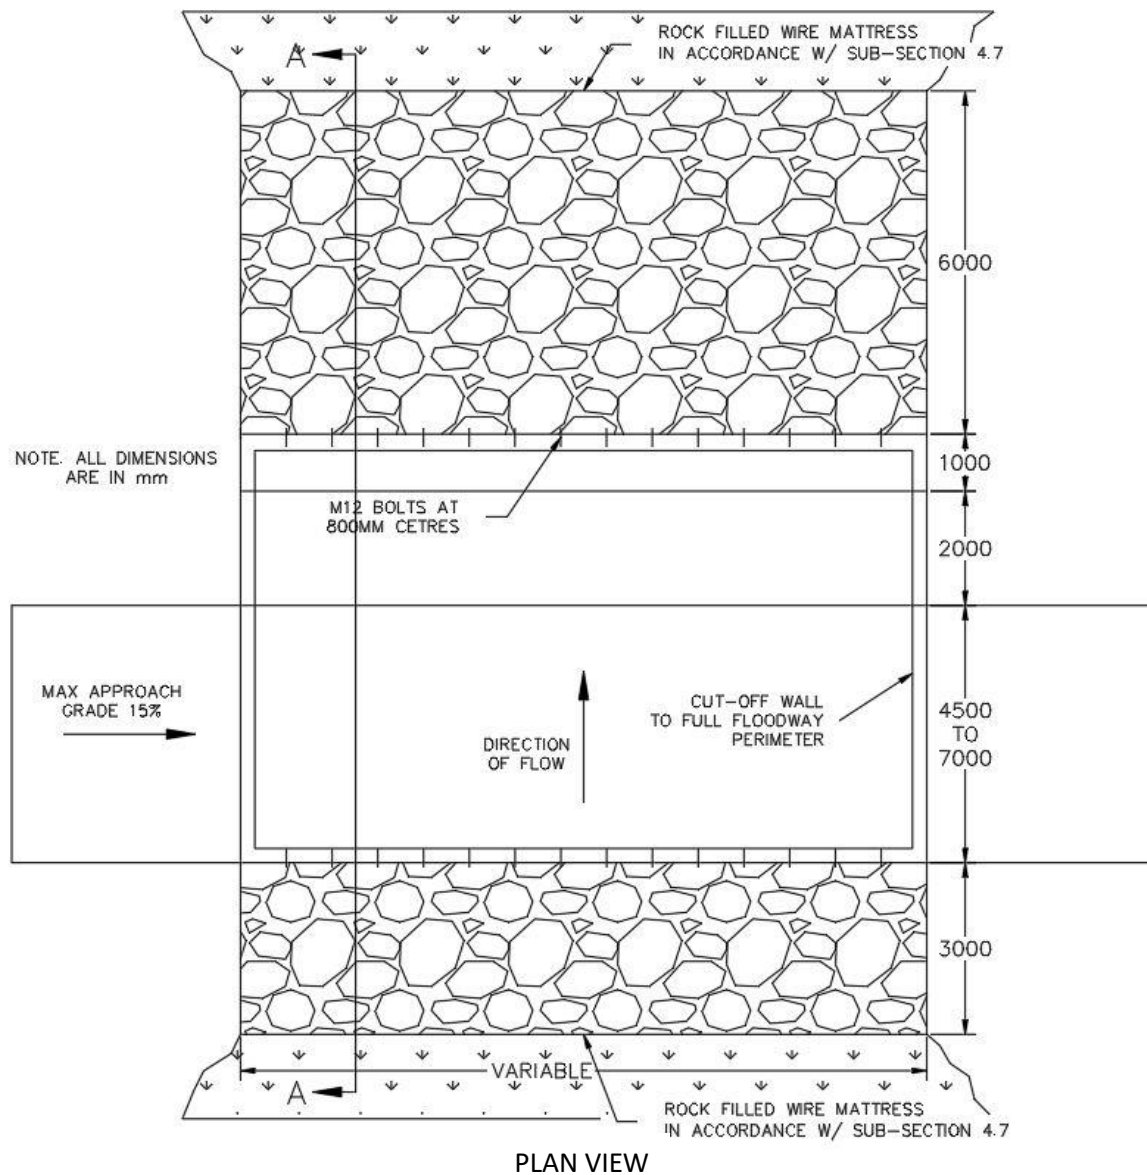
Floodway Type 2 details (LVRC 2008b).
